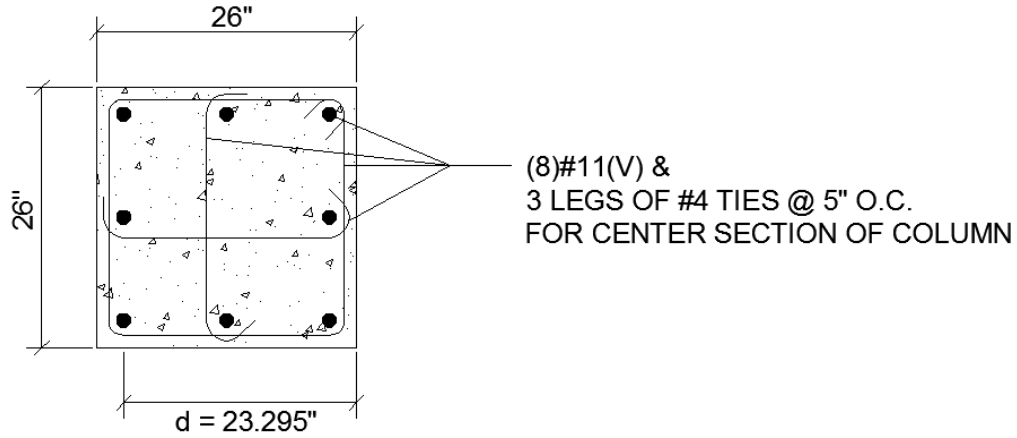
Exterior column cross-section at center of column at ground floor level based on tsunami design requirements
